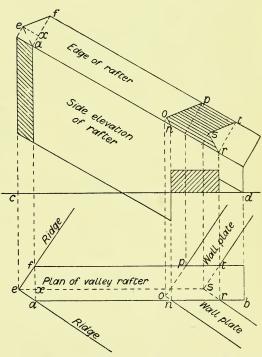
Obtaining Cuts on Valley Rafter at Junction with Ridges and Wall Plates.
